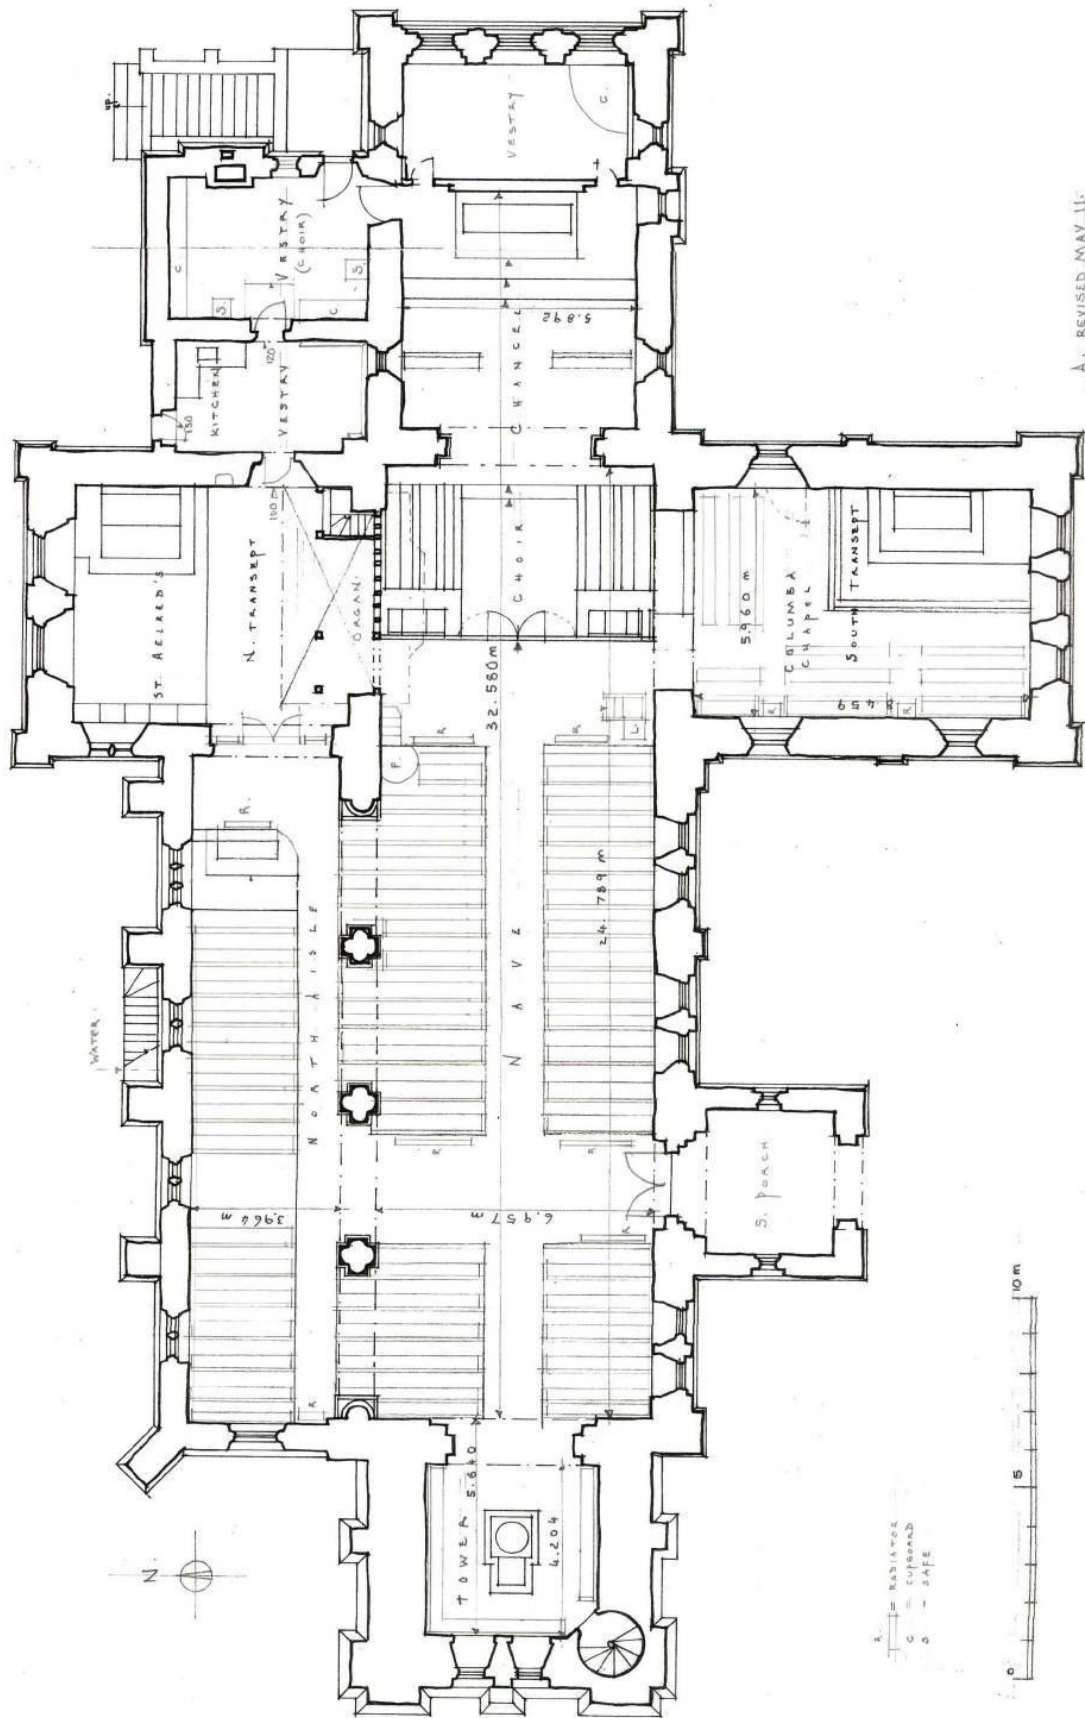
GROUND PLAN OF ALL SAINTS CHURCH
